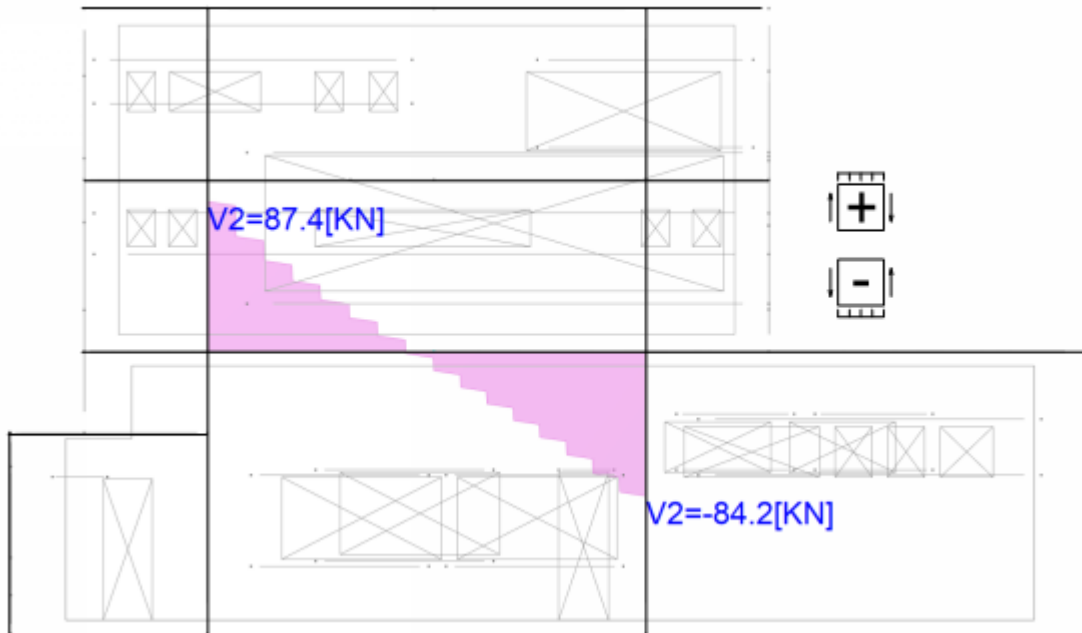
Beam 1A Shear Diagram from RAM Elements
